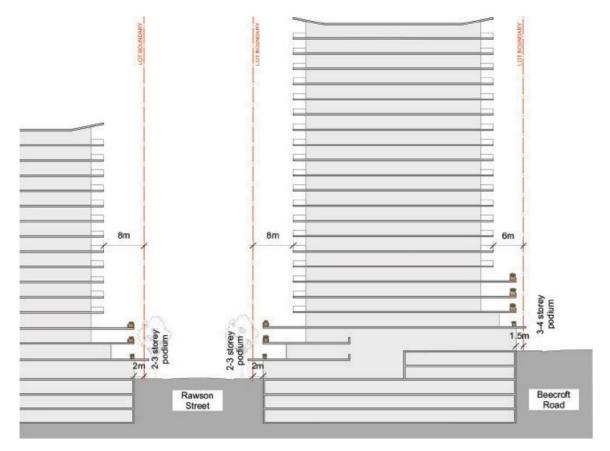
Setbacks to Rawson Street and Beecroft Road
